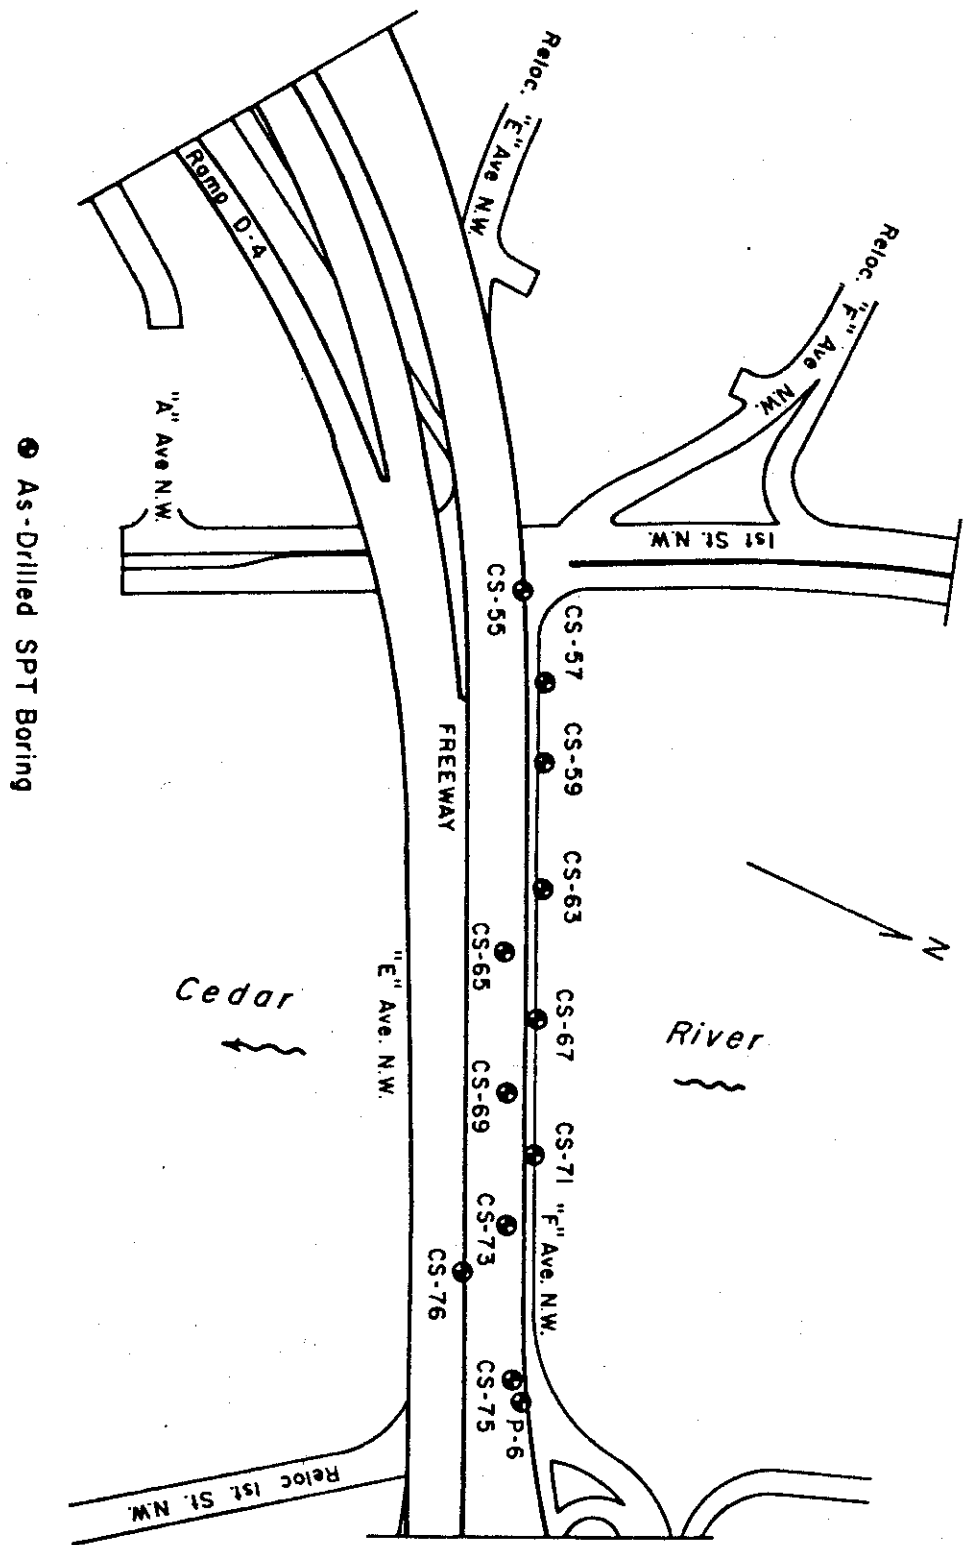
Map view of the 5-in-1 bridge showing pier borings.
